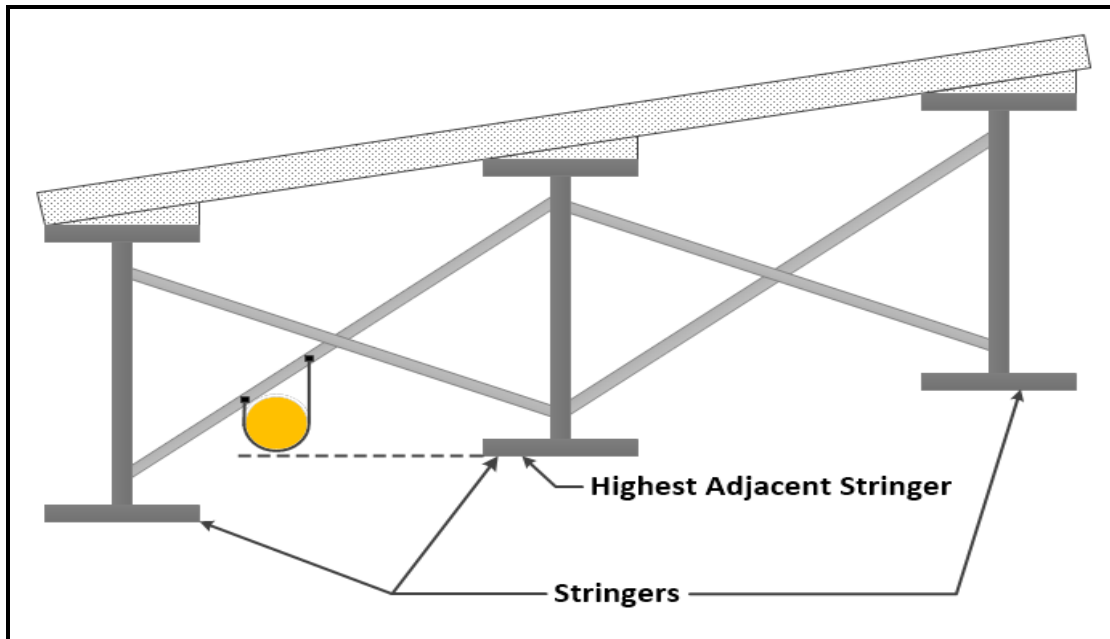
Facilities Next to Highest Adjacent Stringer
